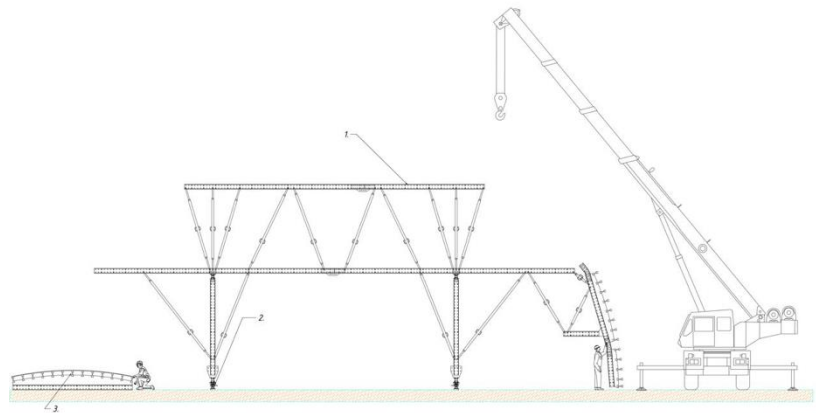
Assembly of the Formwork Structure at the Construction Site.
